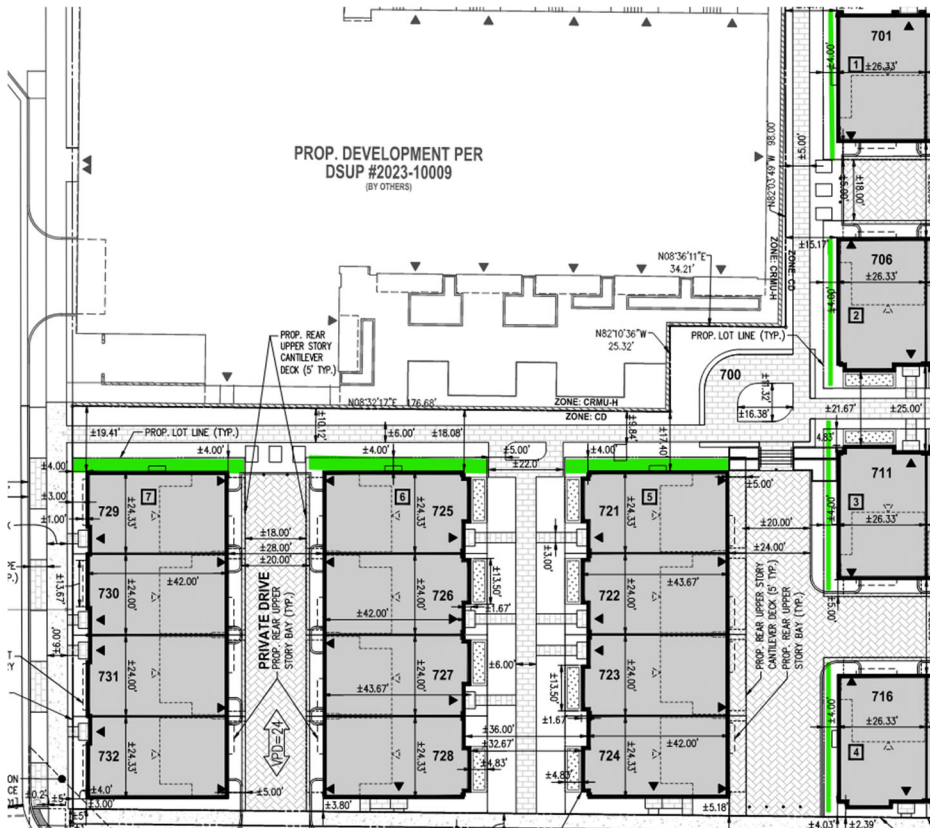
The 4-foot-wide townhouse lot side yards that require relief from the 5-foot minimum yard requirement in the CD Zone. Staff supports the modification as it leaves more common open space in the cluster layout.
